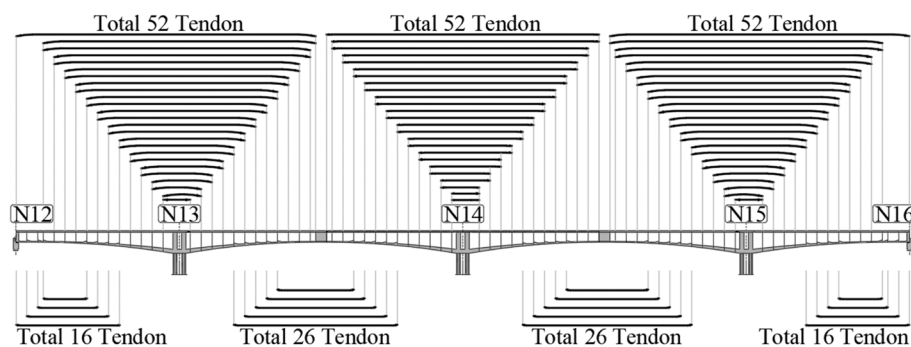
Longitudinal prestressing layout of Girga Bridge
